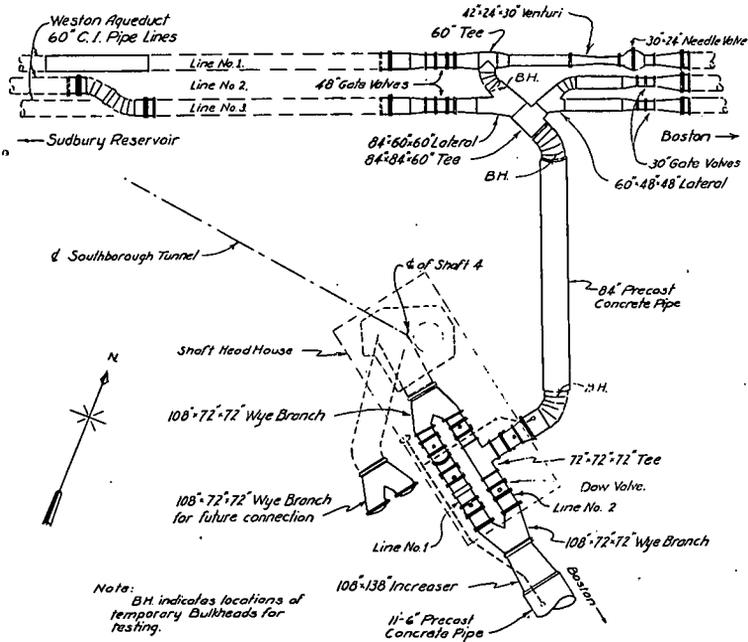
GENERAL PIPING LAYOUT. CONNECTION AT SHAFT 4 AND AT THE WESTON AQUEDUCT.
